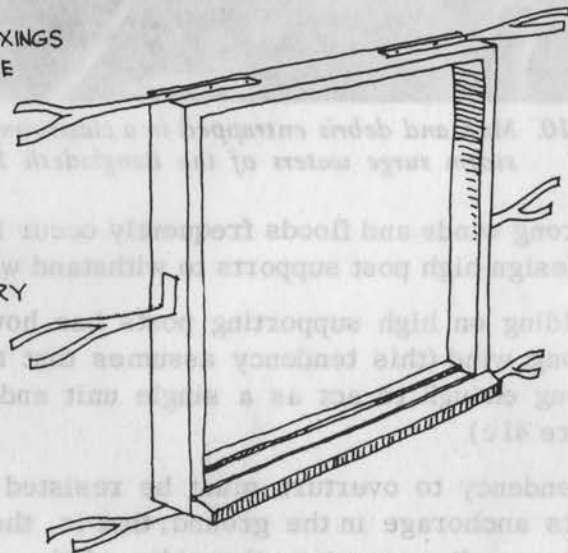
ANCHORING DOOR AND WINDOW FRAMES TO MASONRY WALLS
